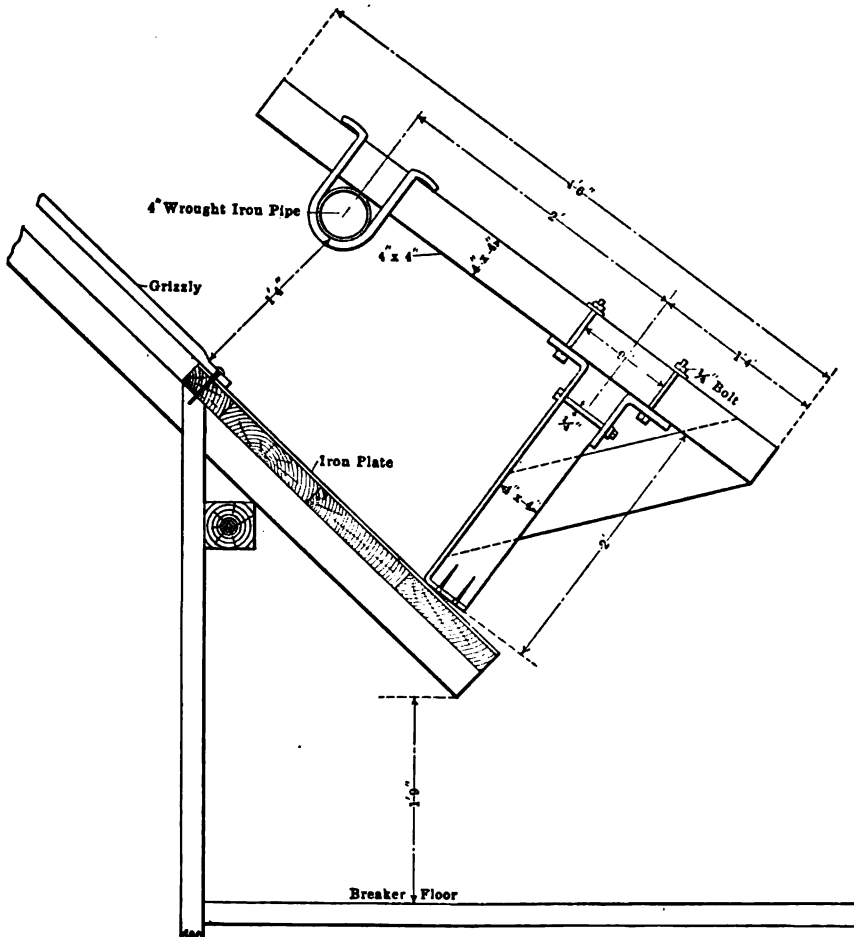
FINGER CHUTE FOR FILLING WHEELBARROWS.
